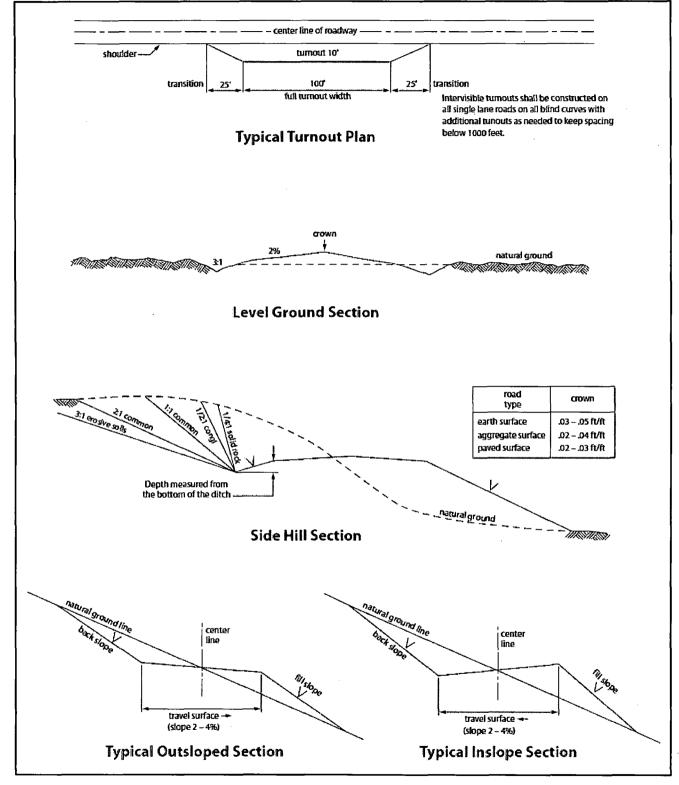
Cross-sections and plans for typical road sections representative of BLM resource or FS local and higher-class roads.
